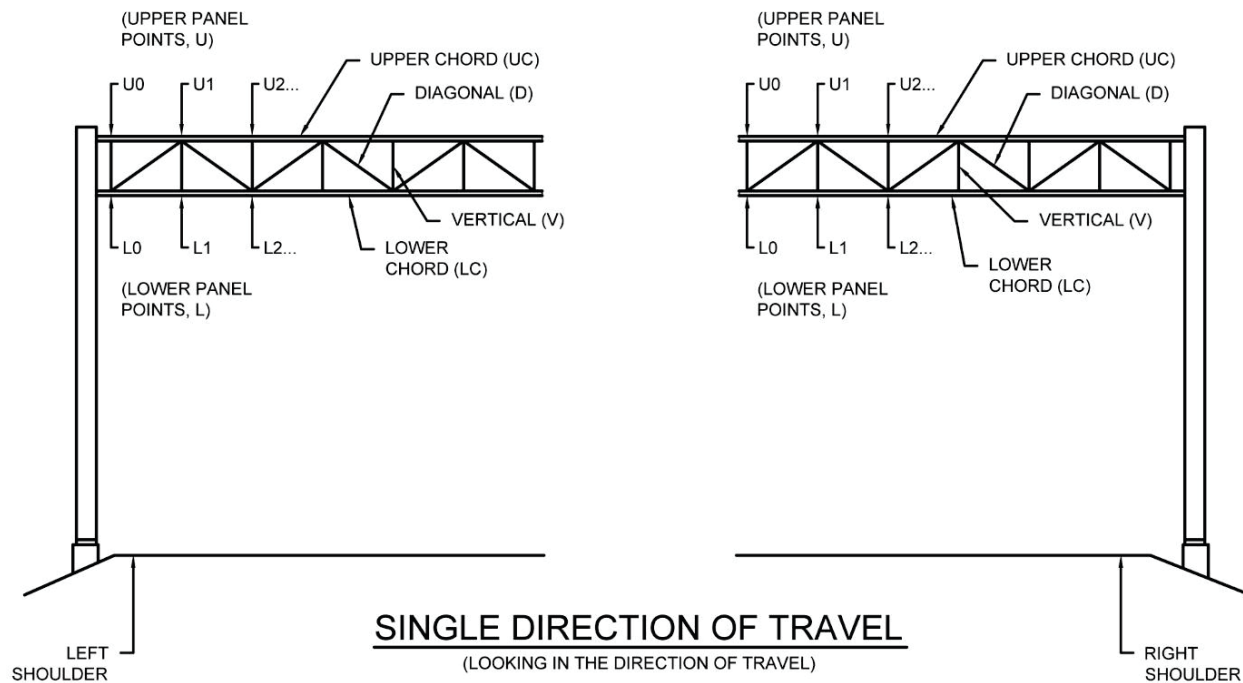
Illustration. Typical trussed cantilever structure numbering convention and nomenclature.
